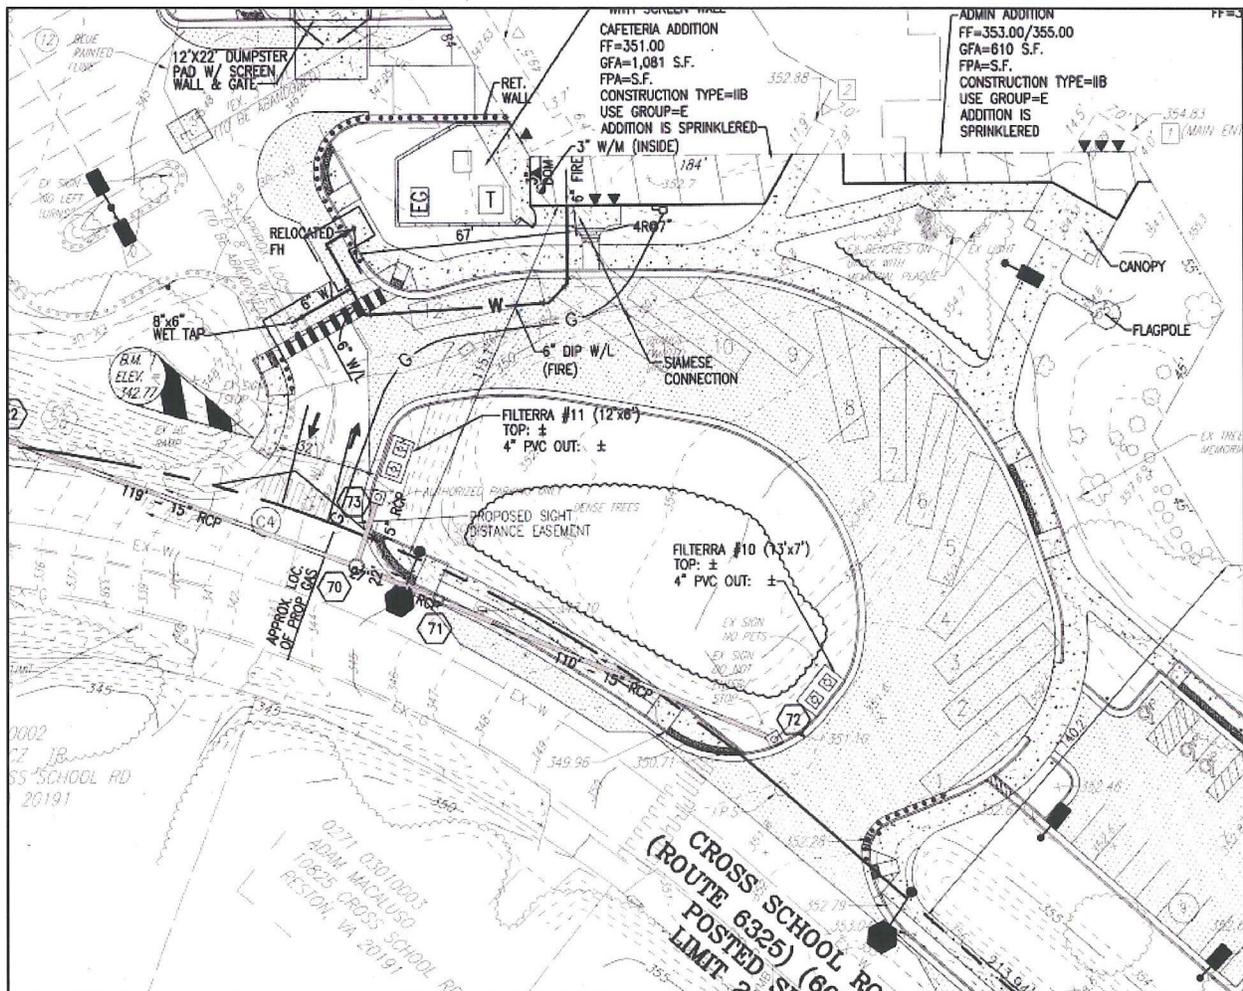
The new drive aisle for private vehicles dropping off or picking up children, with two lanes for extra stacking capacity at its turnaround. The sidewalk area where students would be picked up or dropped off has been identified above. (Source – Adtek Engineers, May 4, 2012)
